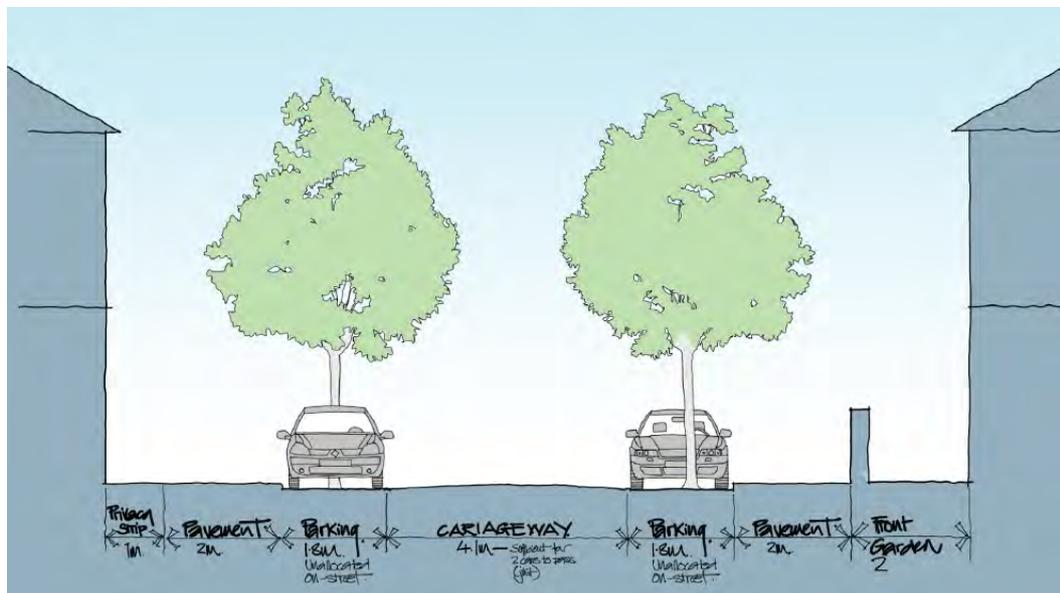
Example cross section through a robust, landscaped street type providing for on-street parking²⁴
